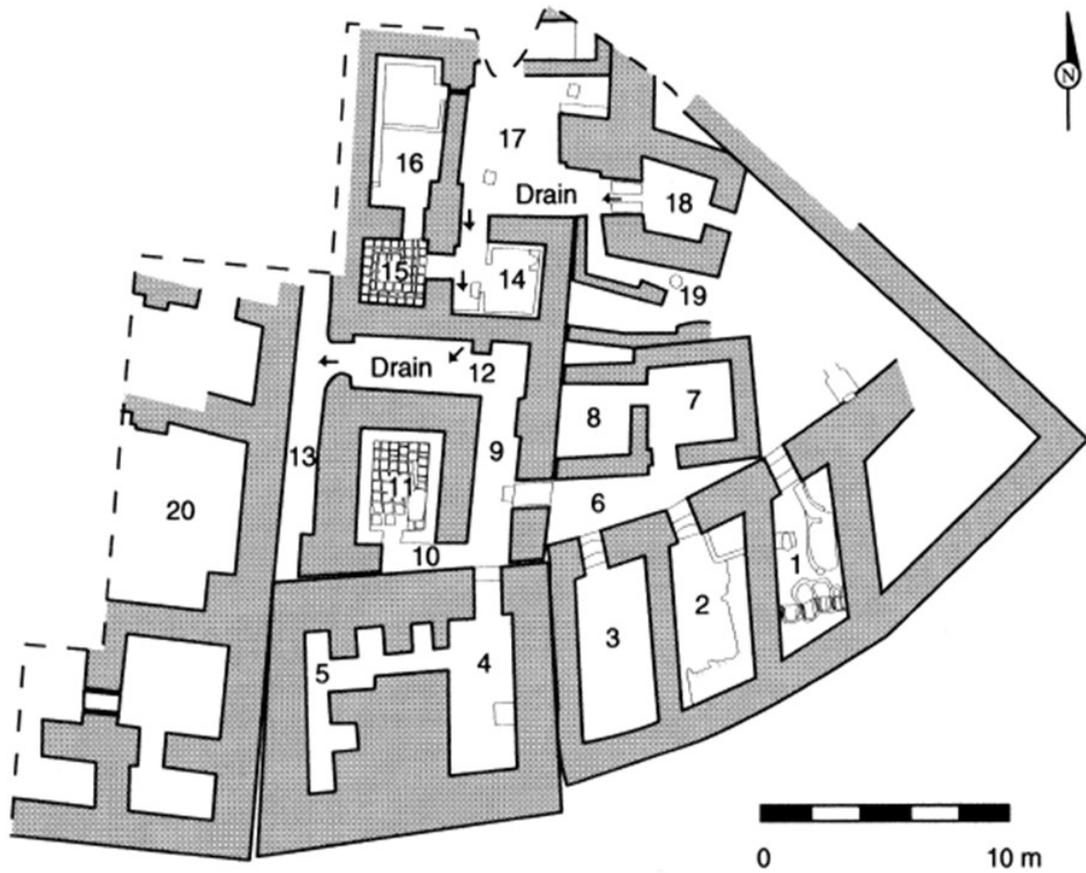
Plan of Area TC and the Temple Oval building (Emberling & McDonald, 2001)
